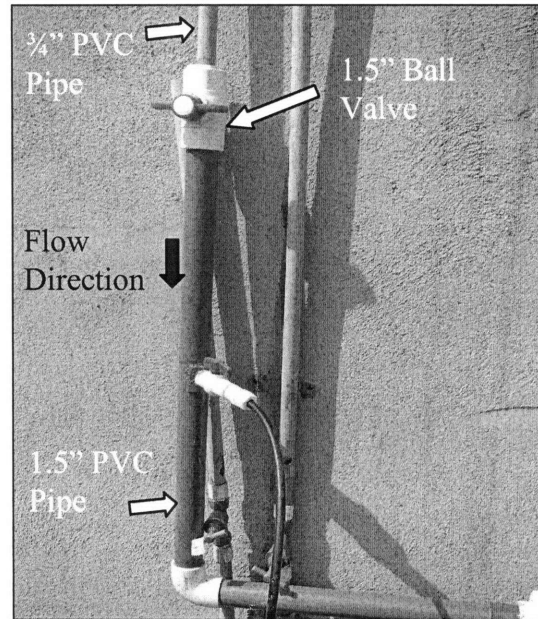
PVC Connections from Elevated Tank to Storage Tank in Ghana
